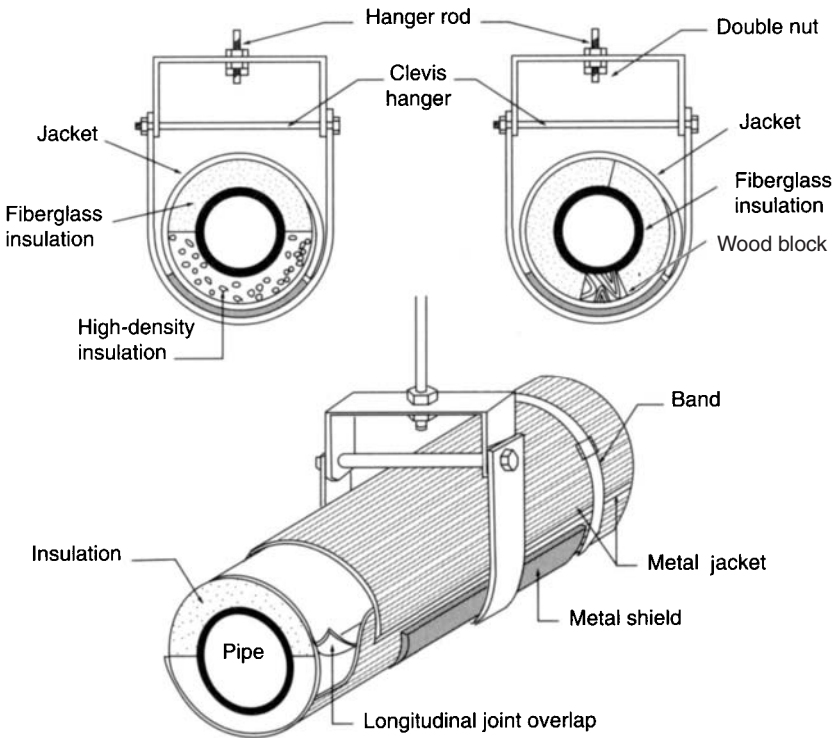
Clevis hanger with protective inserts. (Courtesy Mica.)
